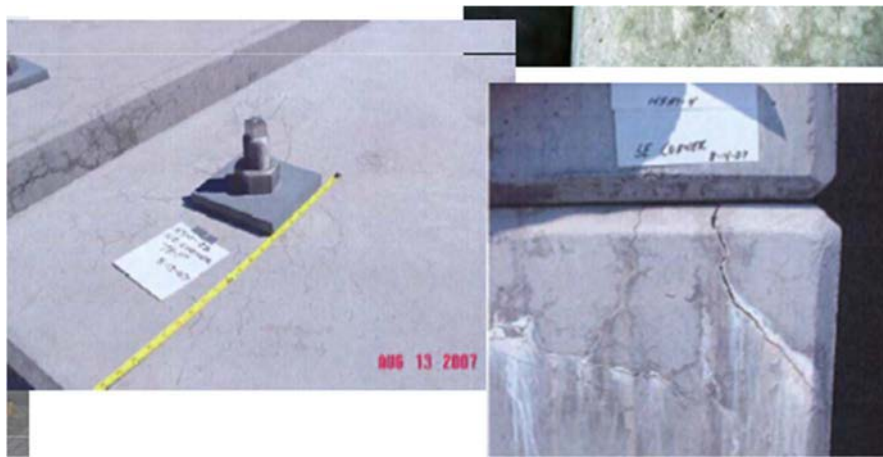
Examples of cracking of HSM concrete (reproduced from Ref. [281] with permission courtesy of US DOE).
